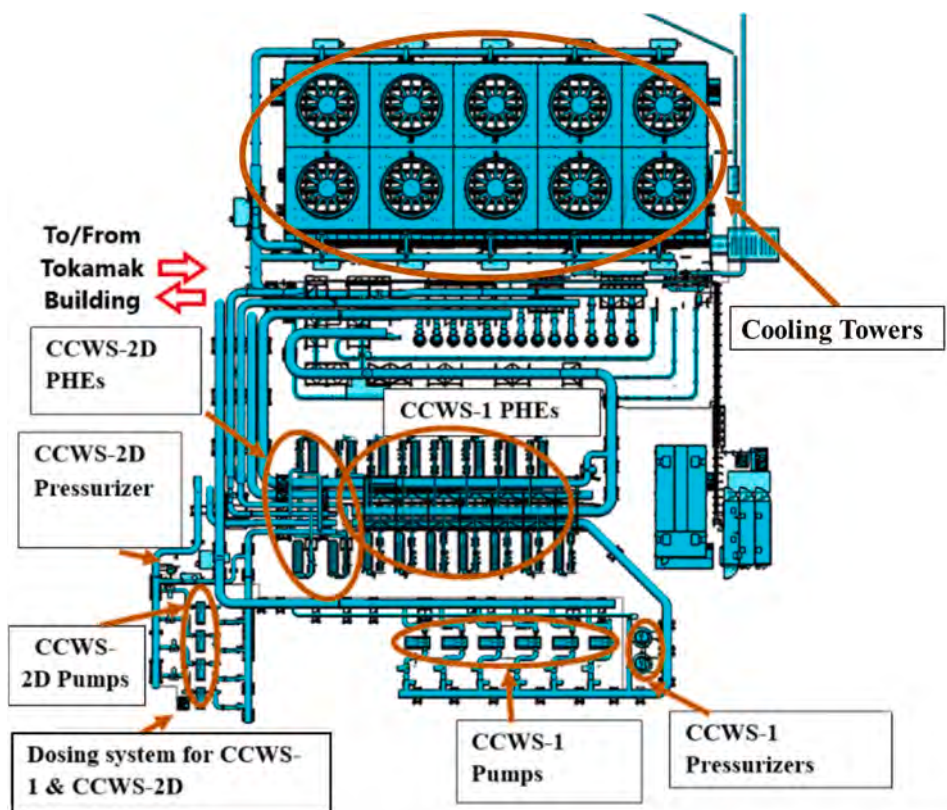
CCWS-1 pipe routing outside Tokamak Building [1].
